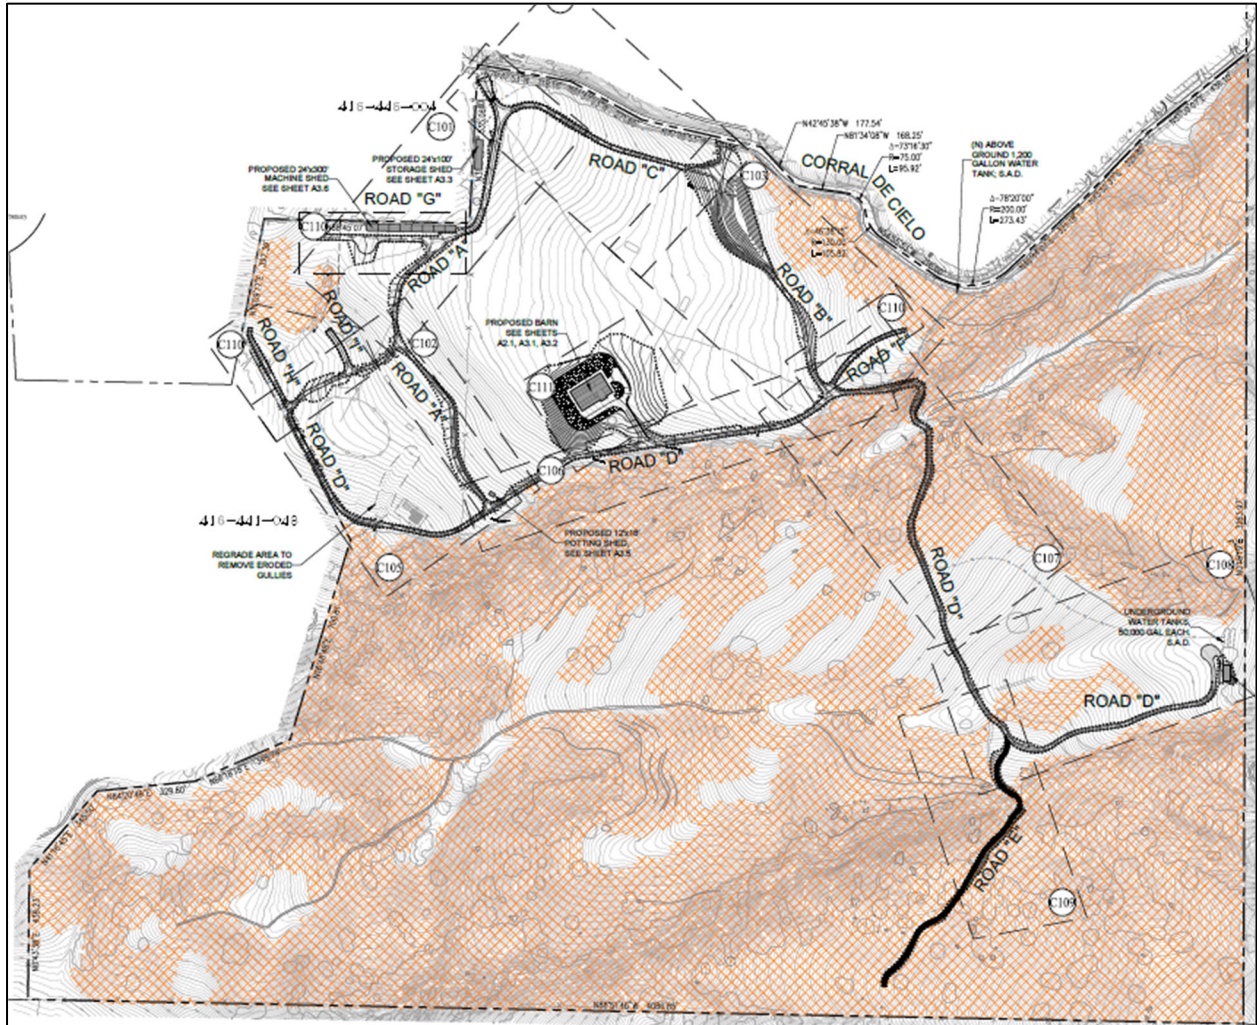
Proposed site improvements plan, with slopes in excess of 25% highlighted in orange crosshatch.
